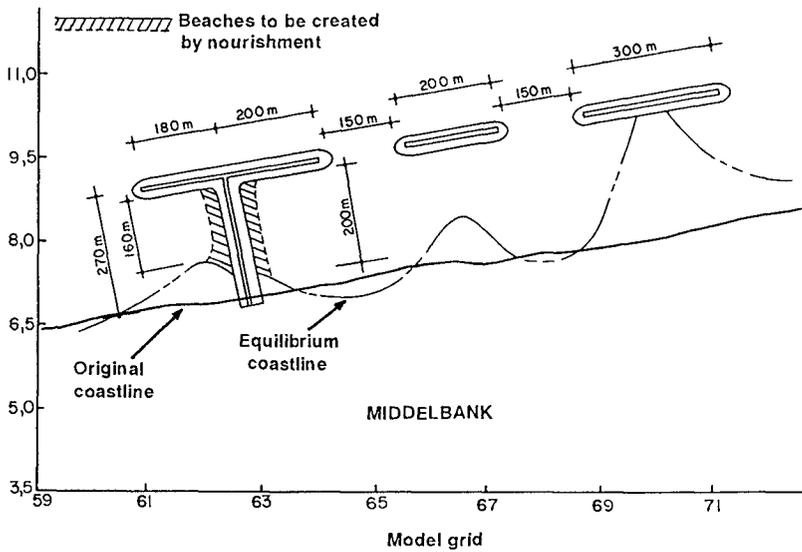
A PROPOSED LAYOUT AT MIDDELBANK
